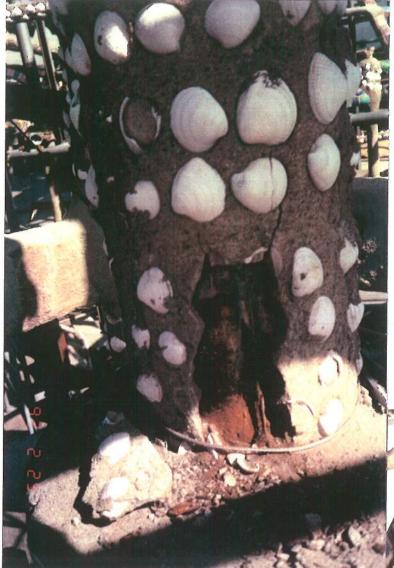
Damage to center column steel reinforcing outside cylinder and inside pipe. Feb 1992. ATO C W.
